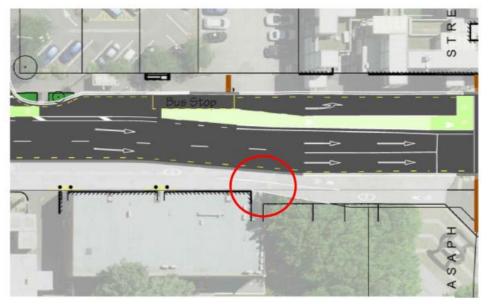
Pinch point at the north end of the Broadcasting School building
